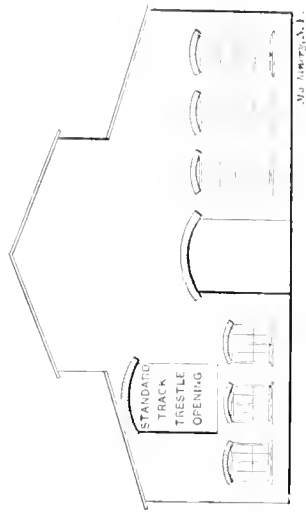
End View, showing Car Trestle, Opening for Discharging Fuel
